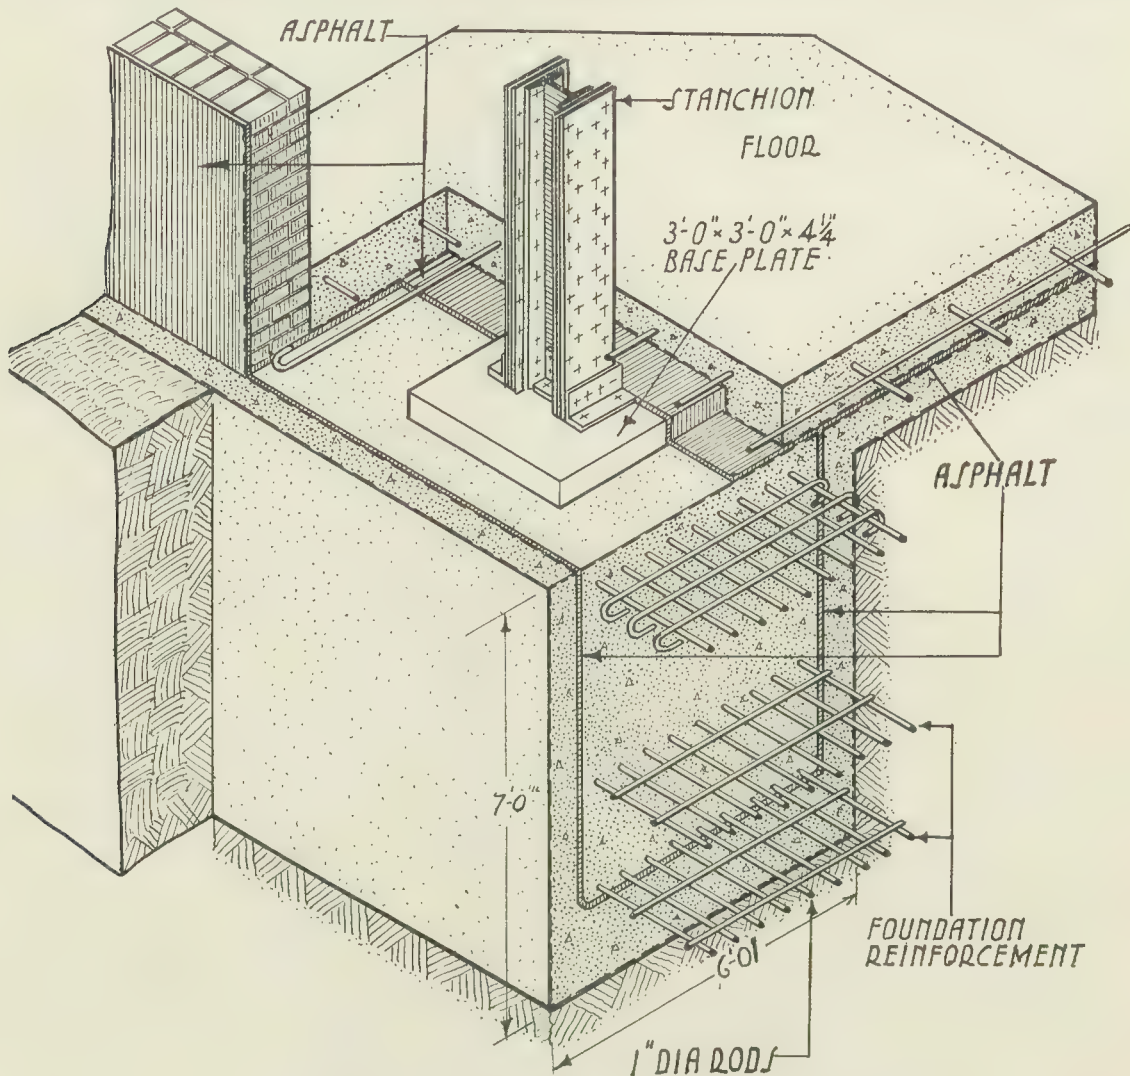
CONTINUOUS SPREAD FOUNDATIONS IN REINFORCED CONCRETE
